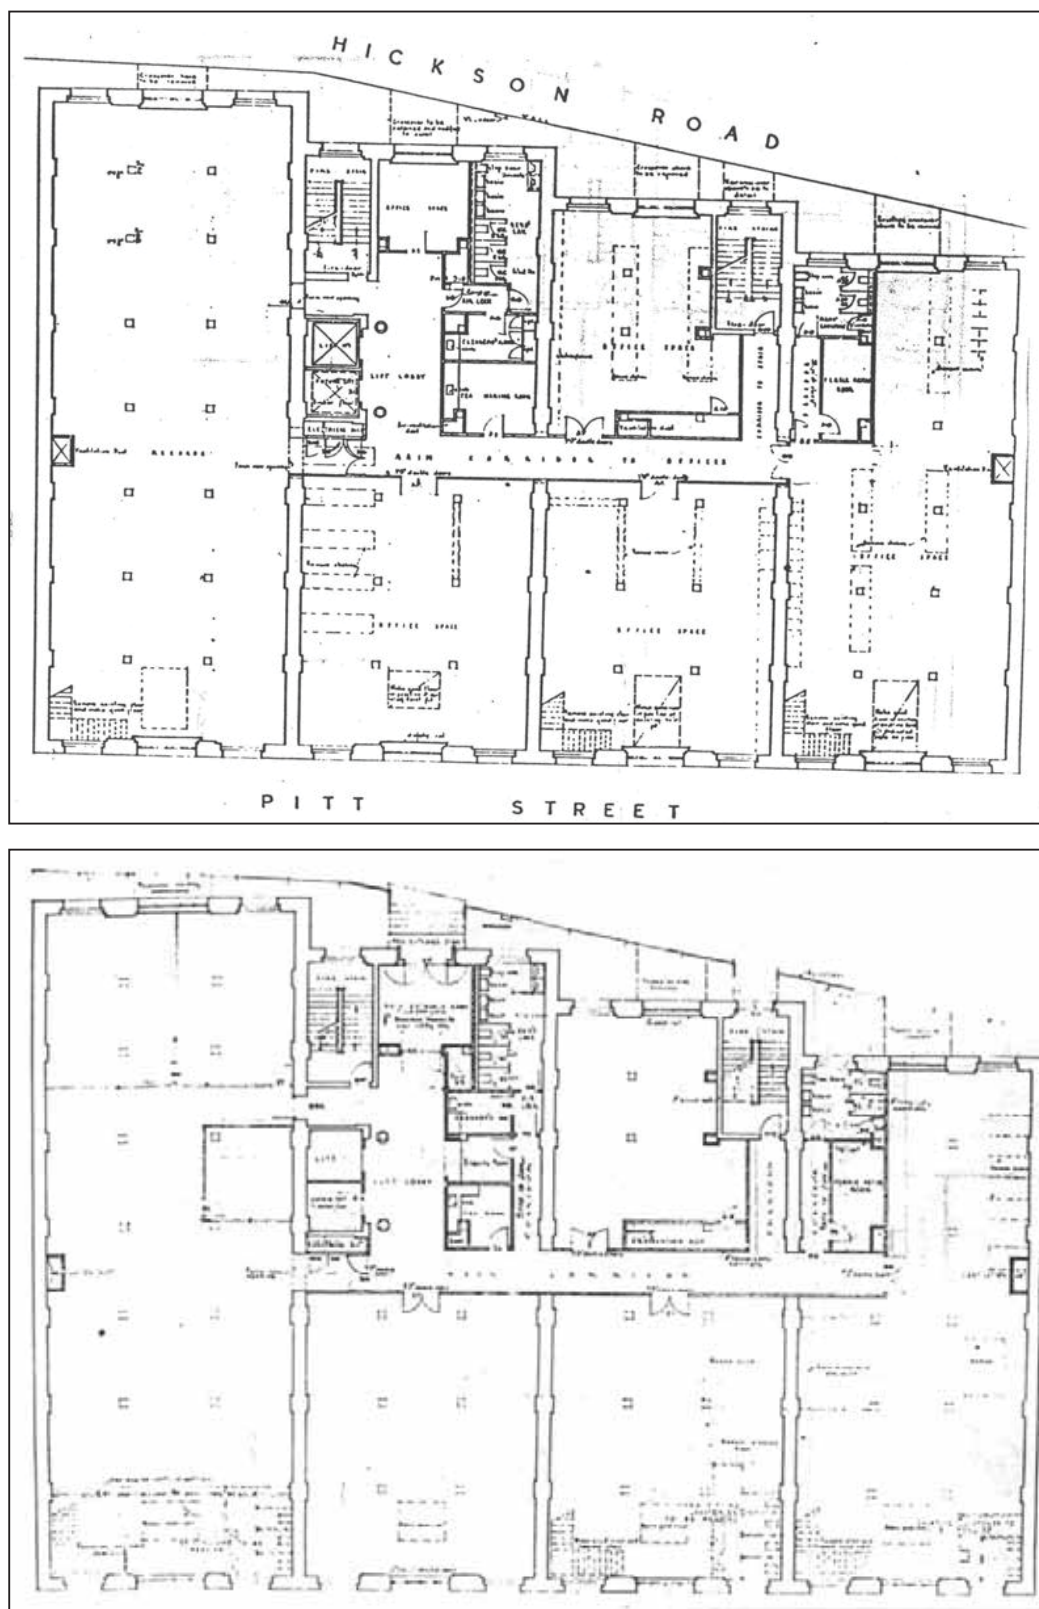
Reproduction of 1949 plans of conversion from warehouse to offices. First & Second Floors, Drawing Nos NA 1375 & 1376
